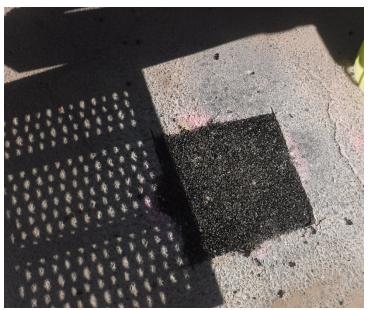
General view of asphaltic concrete patch at boring location.
